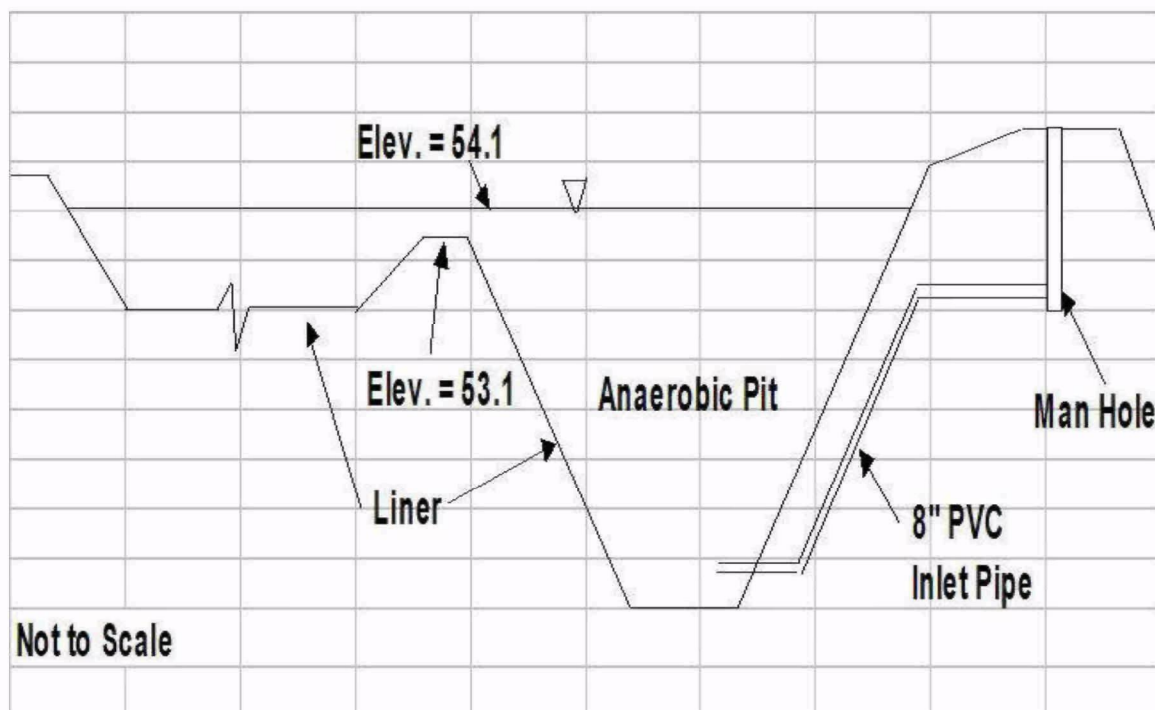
Cross-sectional view of the facultative cell at the Dove Creek, Colorado WWTP.
